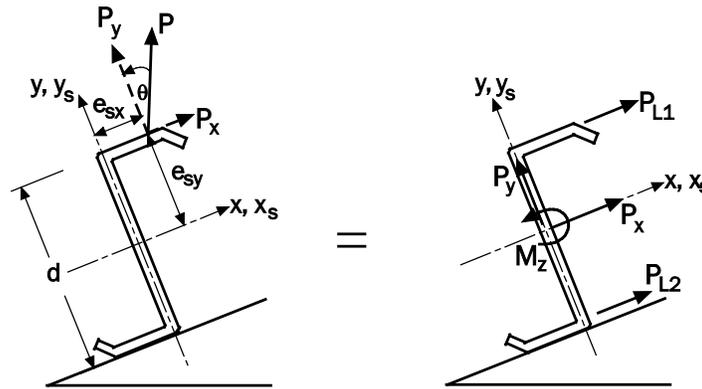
A Z-Section Member Subjected to an Arbitrary Load
